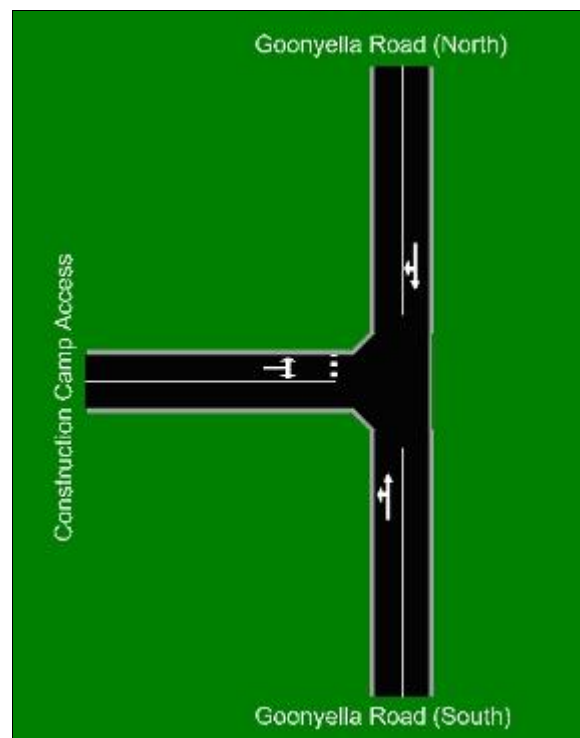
Construction Camp Access/Goonyella Road – Intersection Layout
